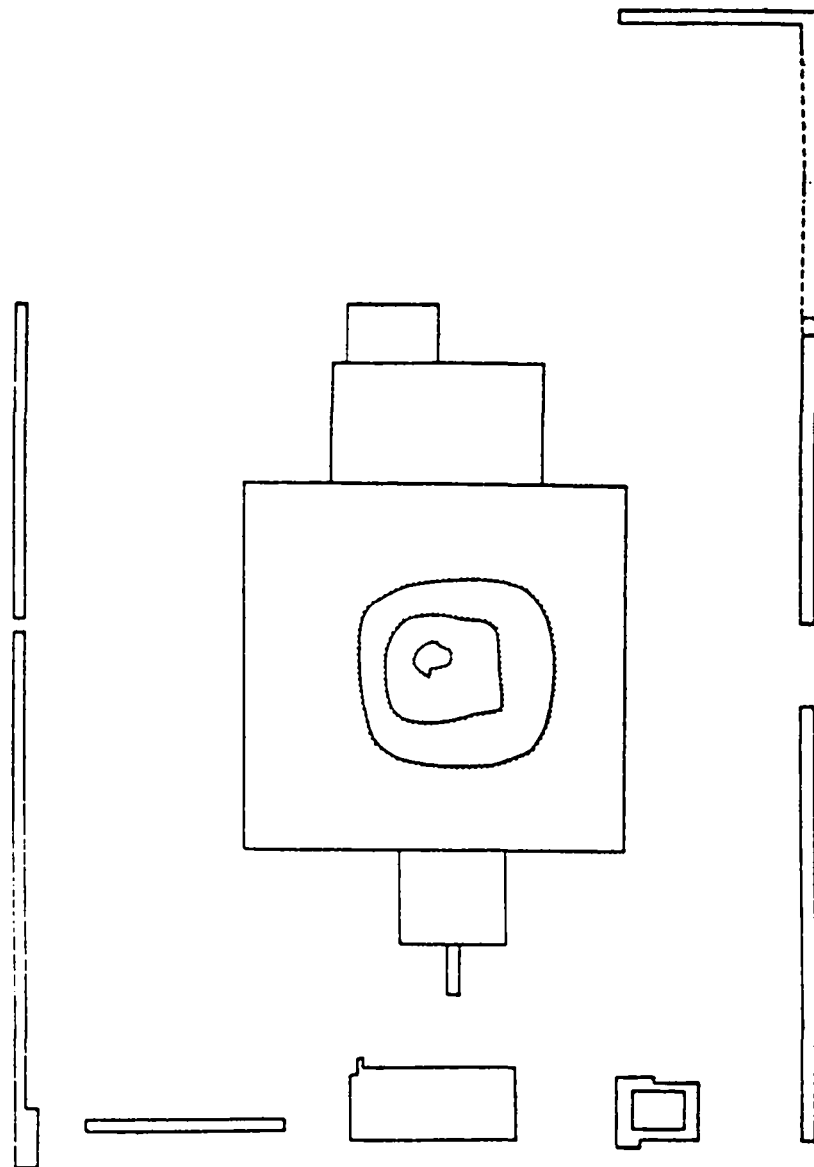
Excavation layout plan of Yongning-si 永寧寺 영녕사 (516 AD, scale : 1 : 2,000)
